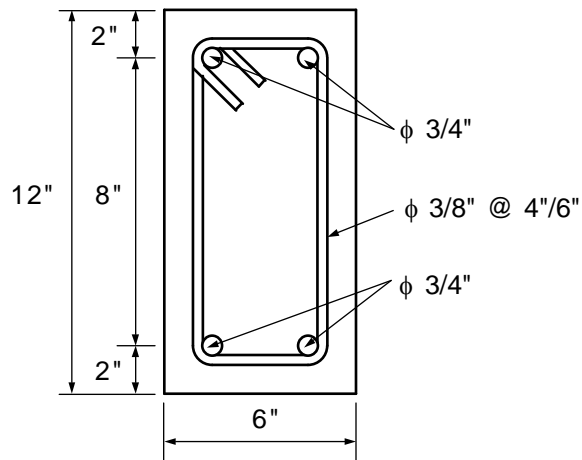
Beam Geometry and Reinforcement (adapted from 4-5)
